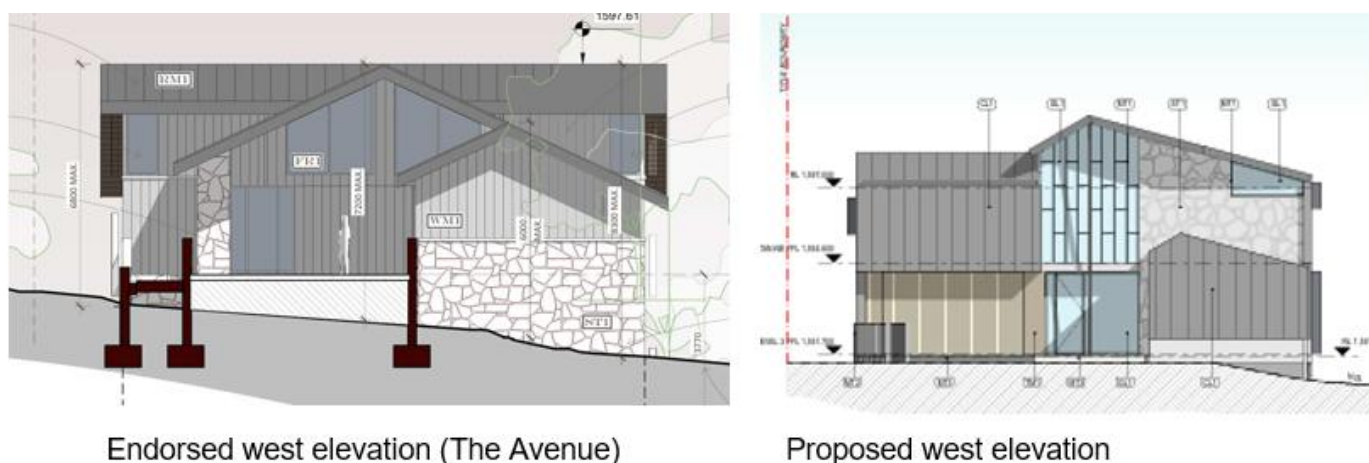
Currently endorsed and proposed west elevations (view from street frontage) (Source: Endorsed architectural plans & Application material)
